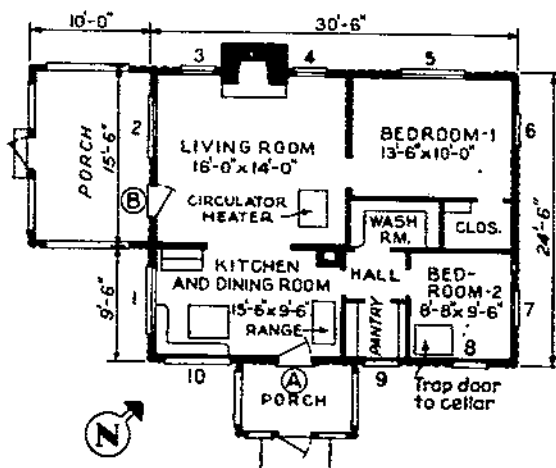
Floor plan of house No. 9, showing location of heating and cooking equipment.
